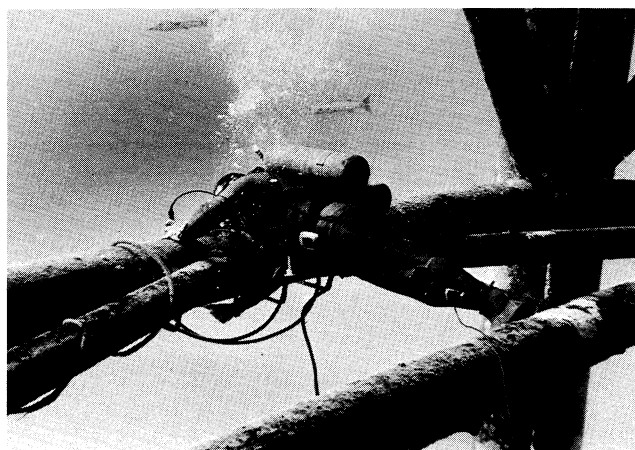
A diver probes a weld with water acting as a continuous scaffold and a sonic couplant
